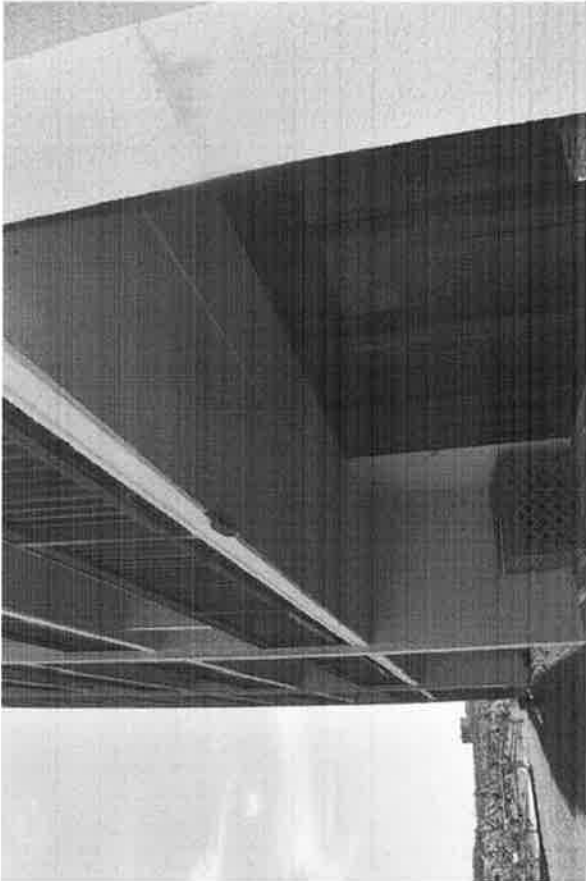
Rust staining near connections between railing and hollow core concrete panel (typical)
